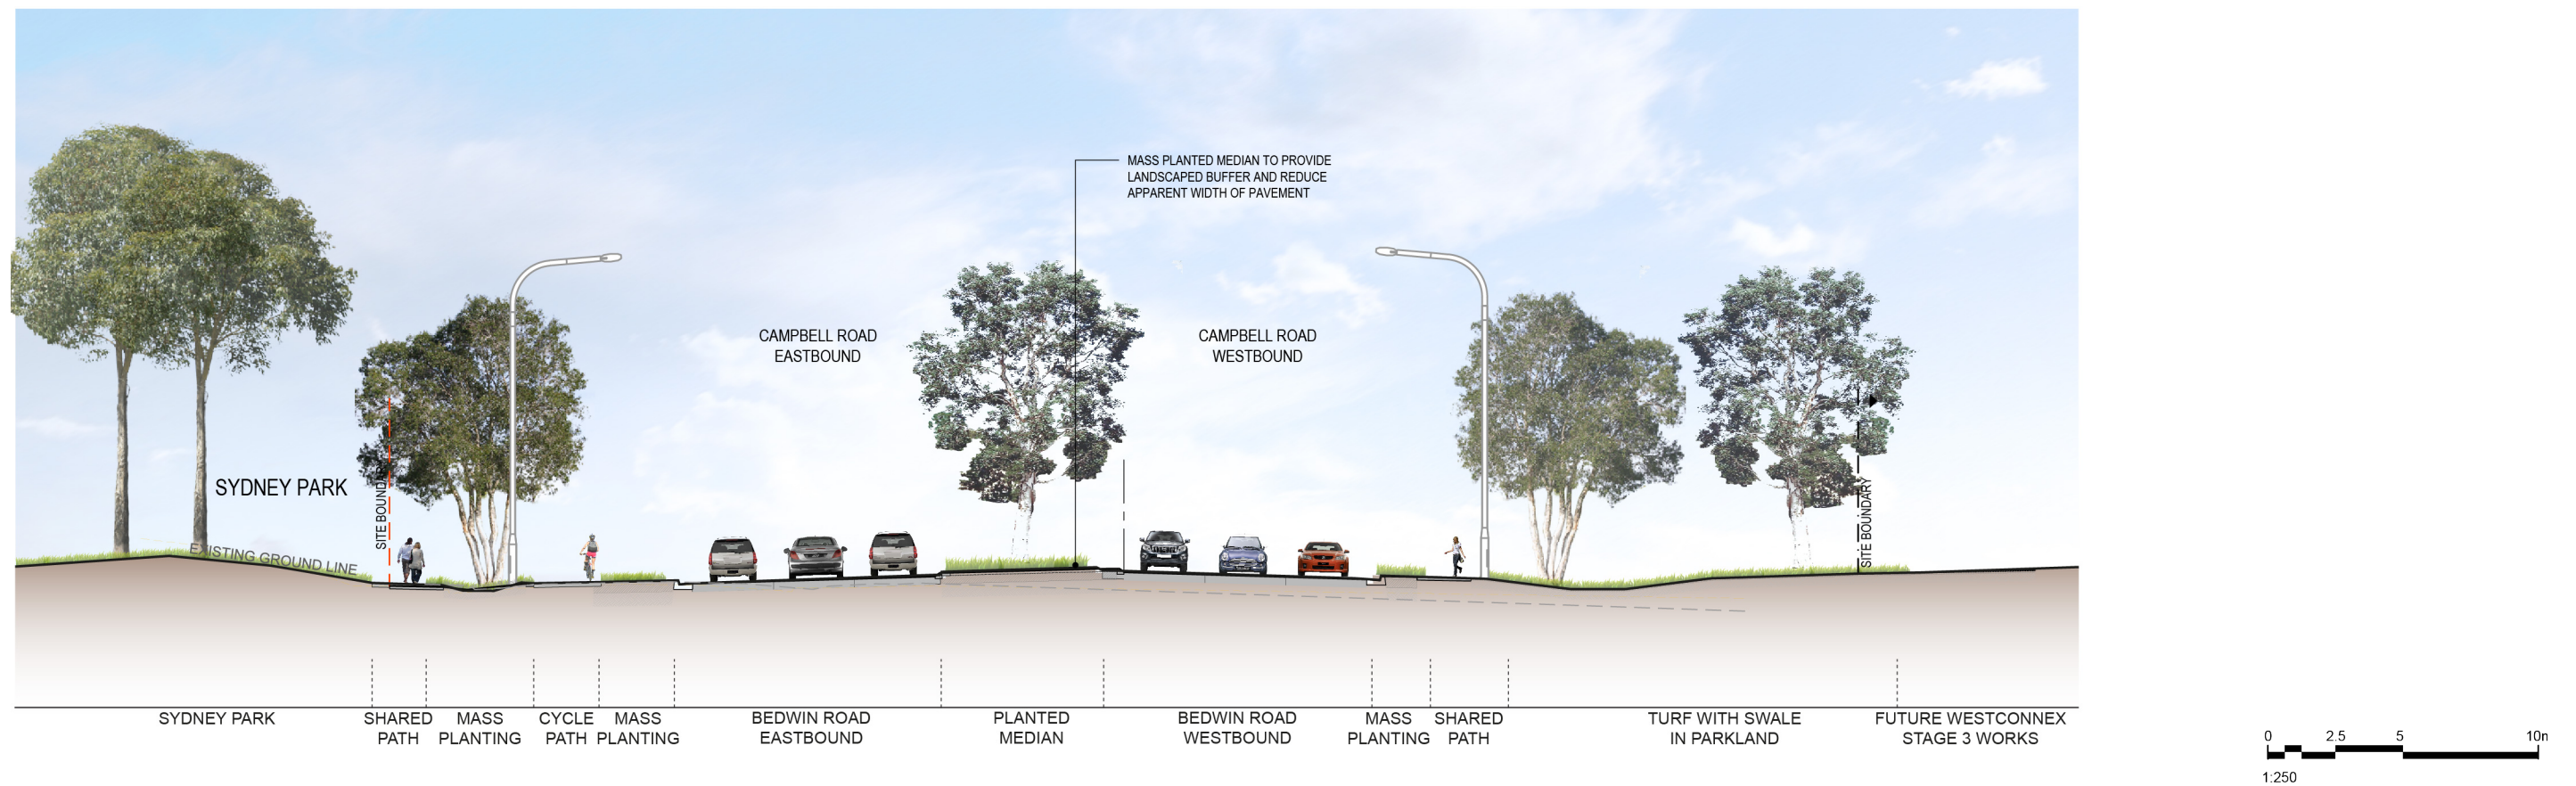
Typical Cross Section - Campbell Road and Sydney Park - 1:250
